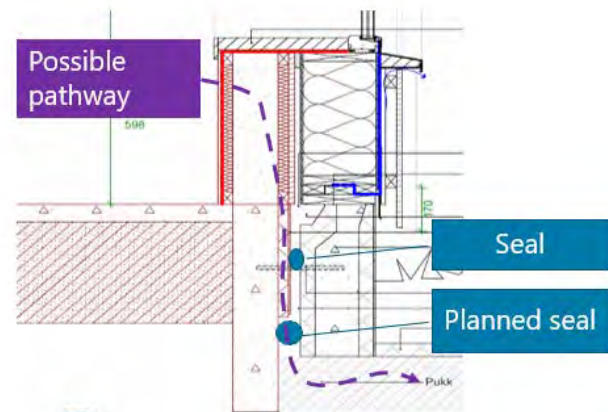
Construction detail existing and new construction at foundation level, indicating possible pathway for leakages.
